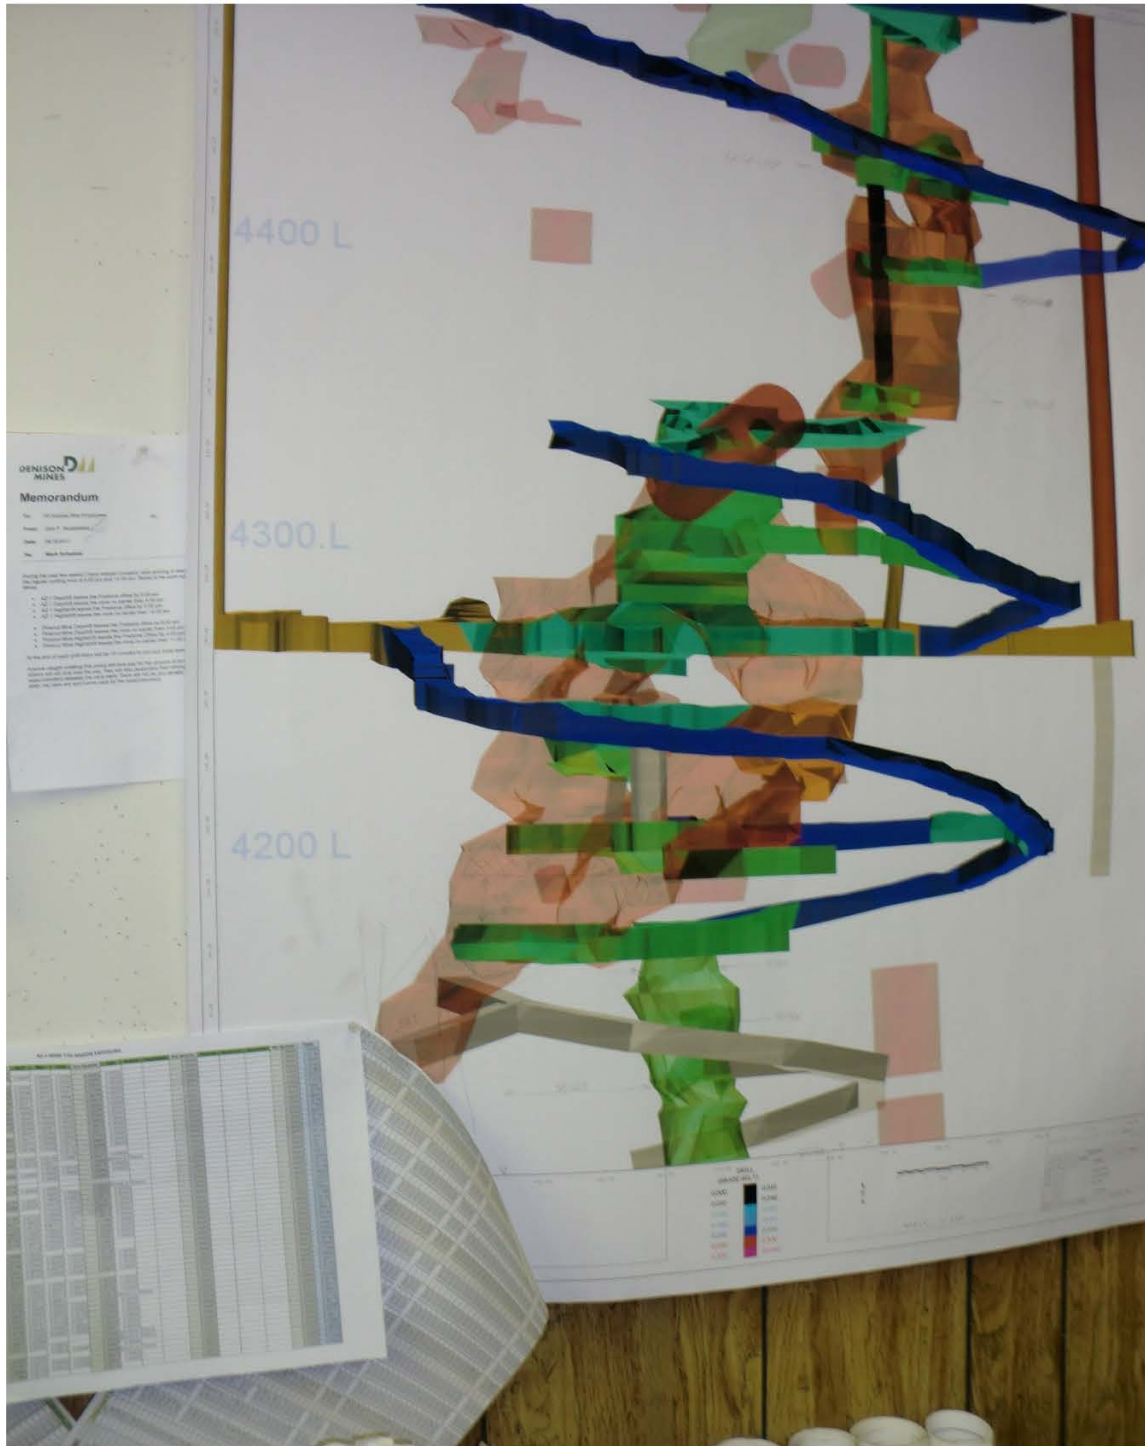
Drawing in mine office of underground breccia pipe mine workings at Arizona No. 1 mine. Straight, brown, vertical lines on each side are main and escape shafts, with horizontal drift. Blues and greens are drifts, spiral passageways, and stopes. Photo taken by M. Linden, 10-26-11. .
